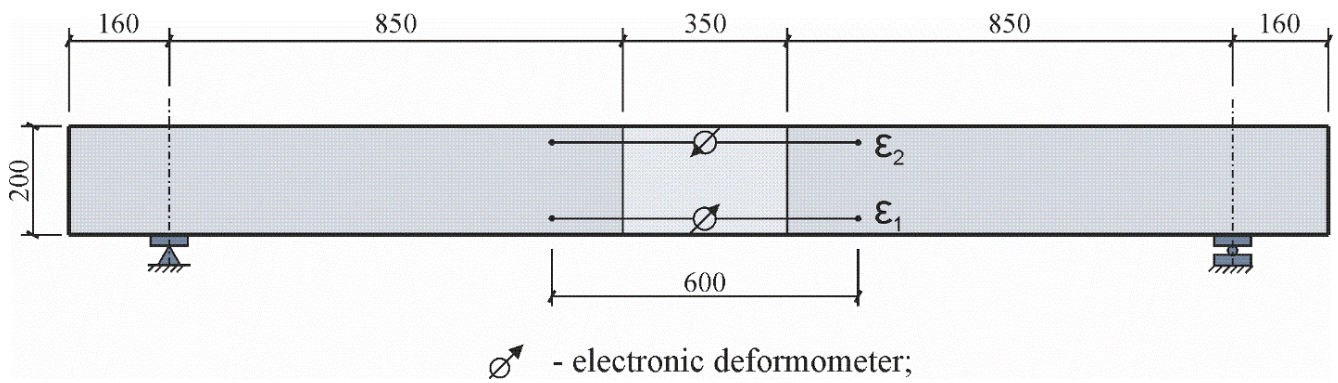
Scheme of benchmarks arrangement on an experimental beam for measuring deformations at the self-stressing stage of concrete of a loop connection (BI EC – BV EC)
